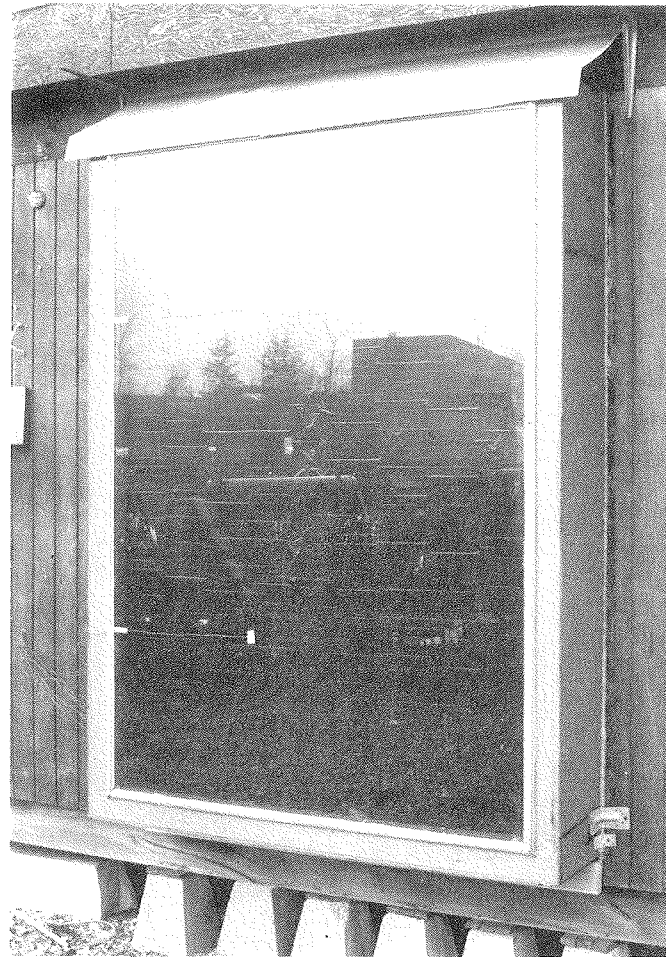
Photograph of the internally ventilated Trombe wall.
